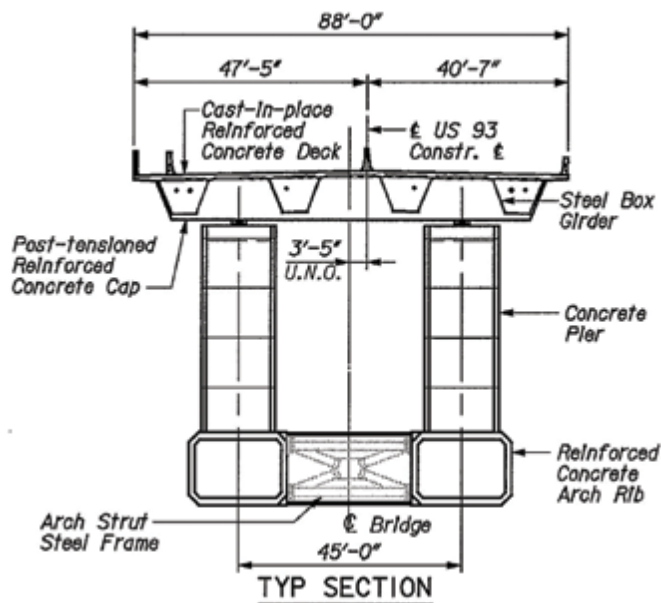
A typical bridge cross section (Note: 1 ft = 0.305 m; 1 in. = 25.4 mm) (illustration courtesy of FHWA)
